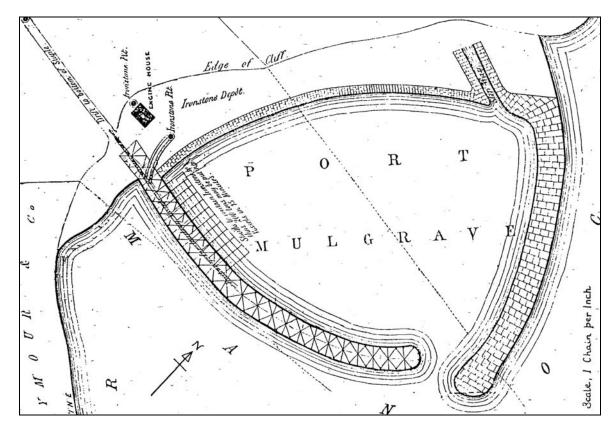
Plan from 1862 of the Harbour and Access Tunnel created for Grinkle Ironstone Mine at Port Mulgrave (Owen 1988)
